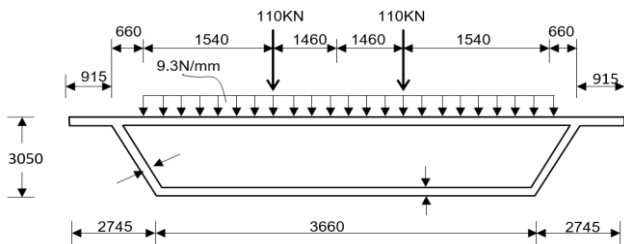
Mono-symmetric box girder. (The bridge is span 50m between piers)
